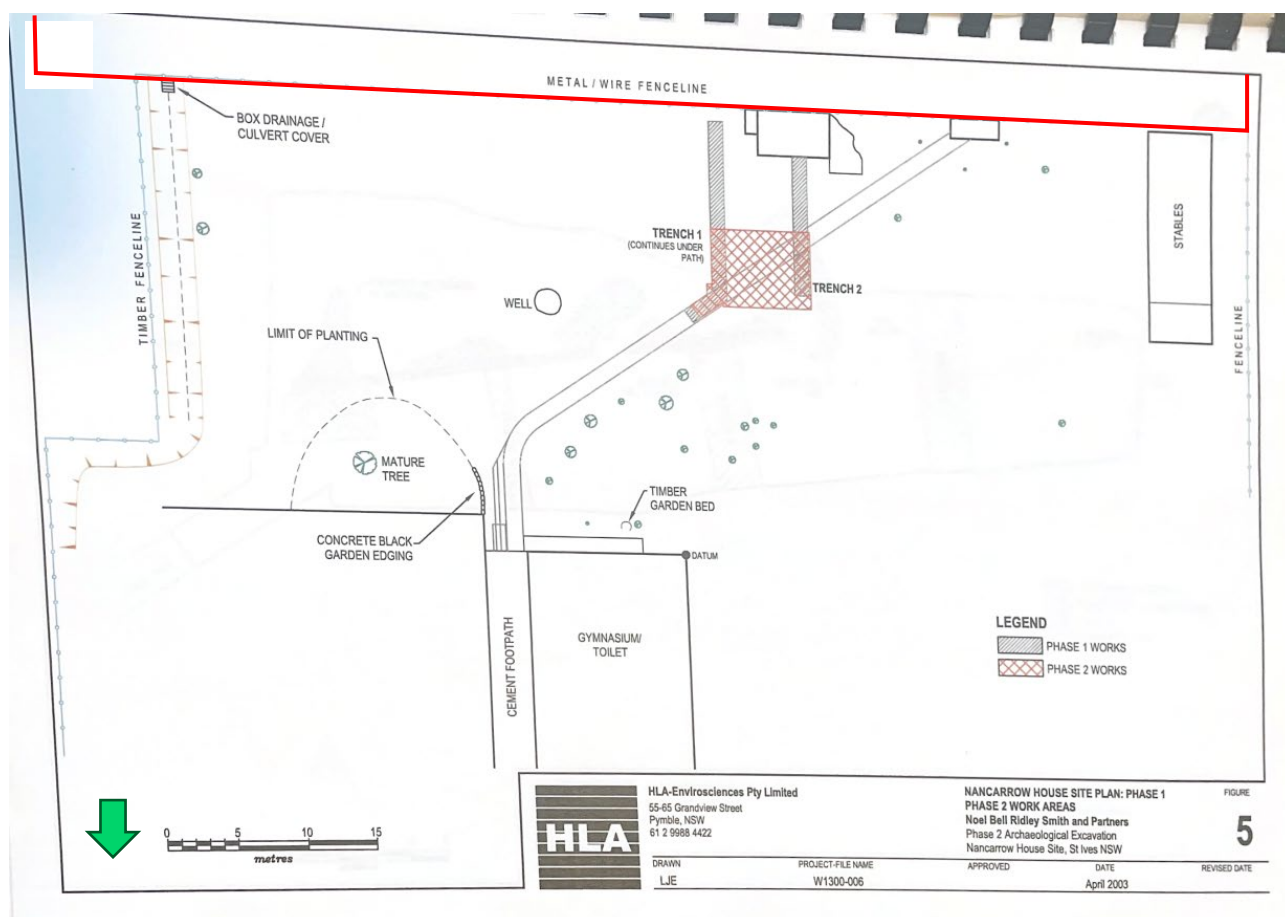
Nancarrow Farmhouse Site Plan, Phase 2 Excavation. The approximate location of the present subject area is indicated in red.
